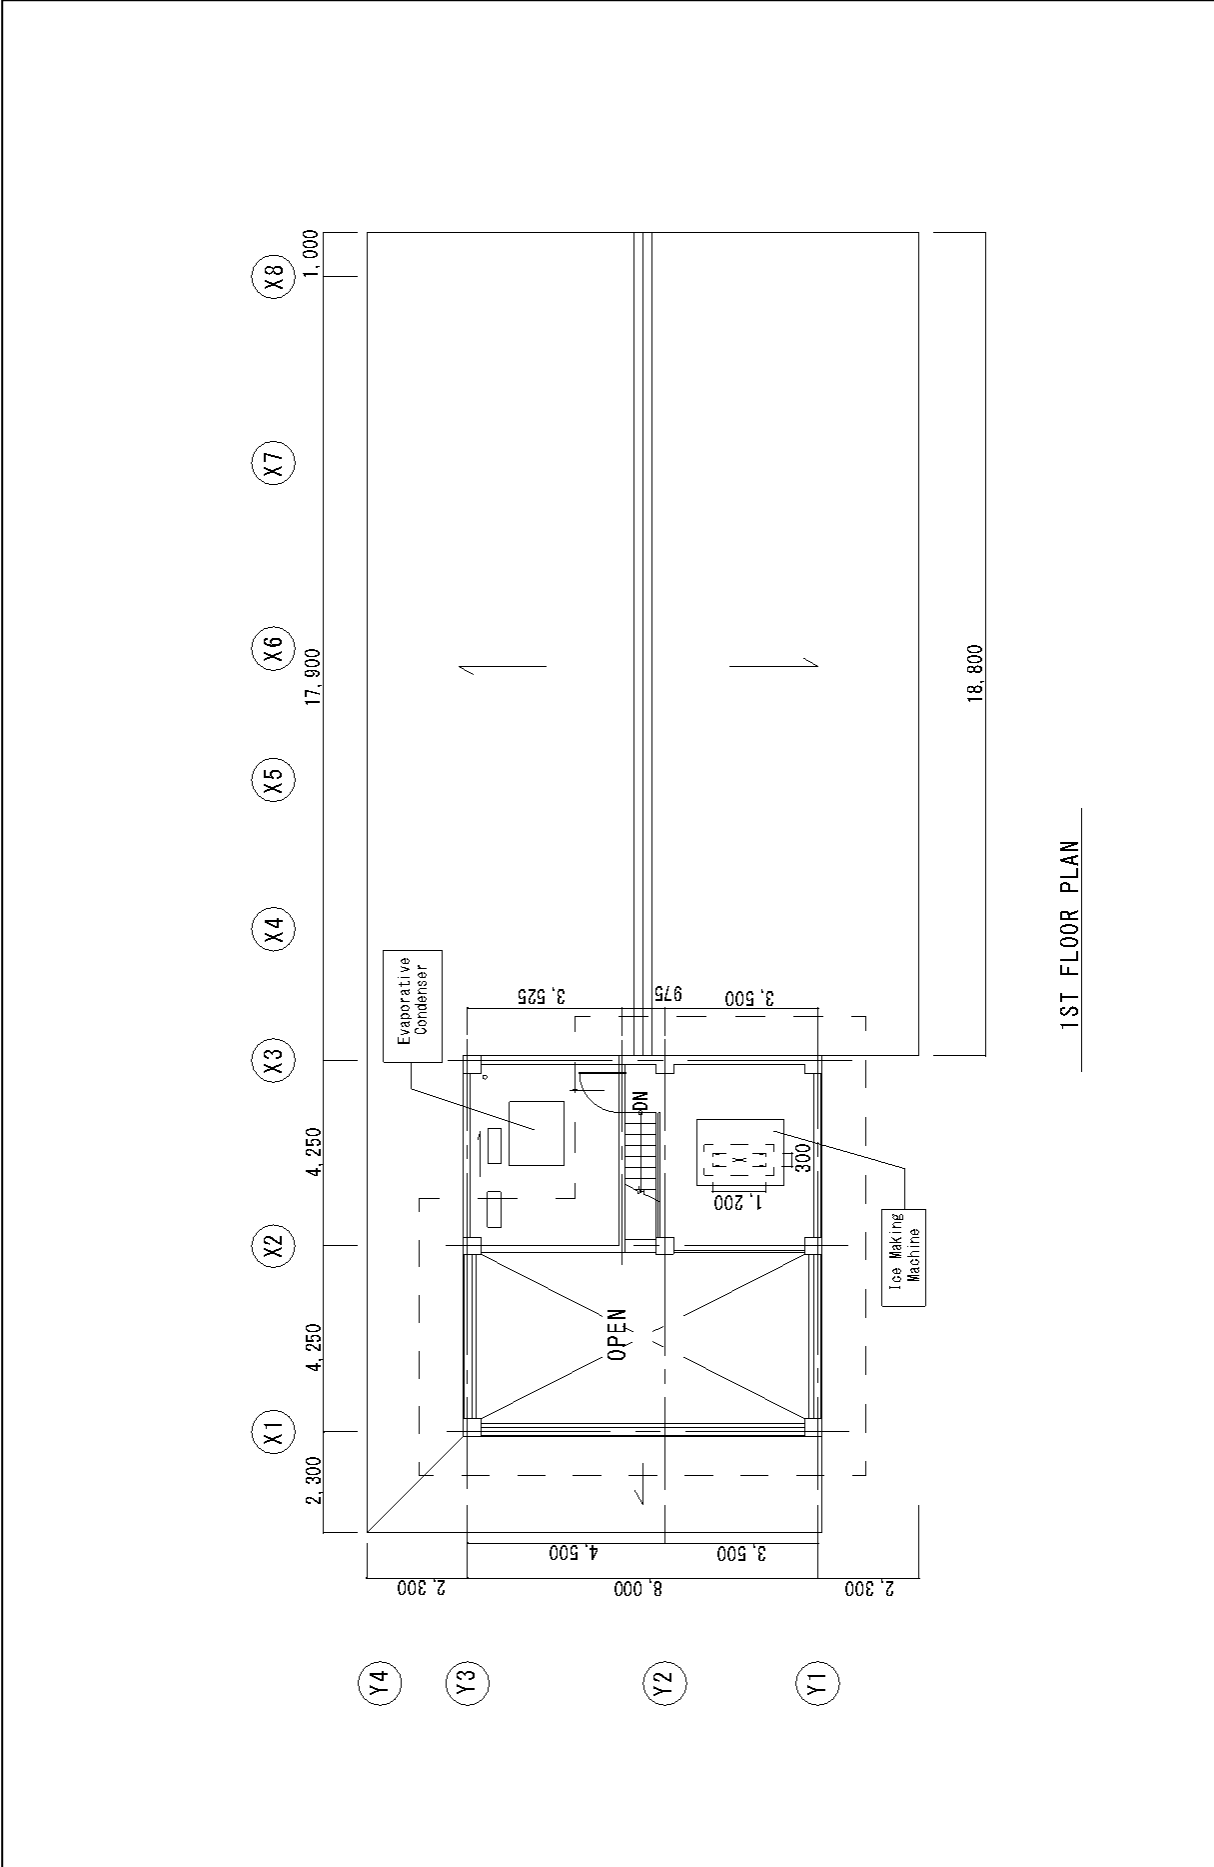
(6) Floor Plan of Fishery Complex (First Floor)
